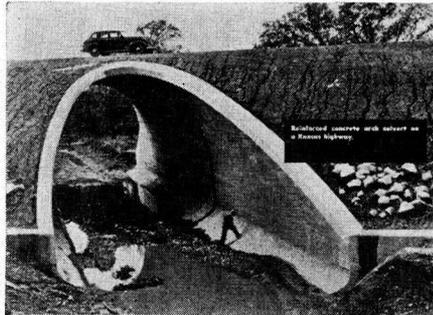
Reinforced Concrete Arch. Courtesy of Engineering News Record, March 9, 1944.
